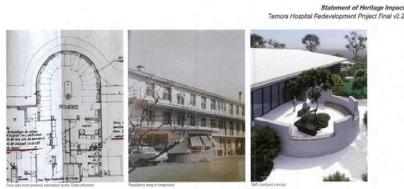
Proposed integration of existing ground floor curved wall into design of new hospital building.
